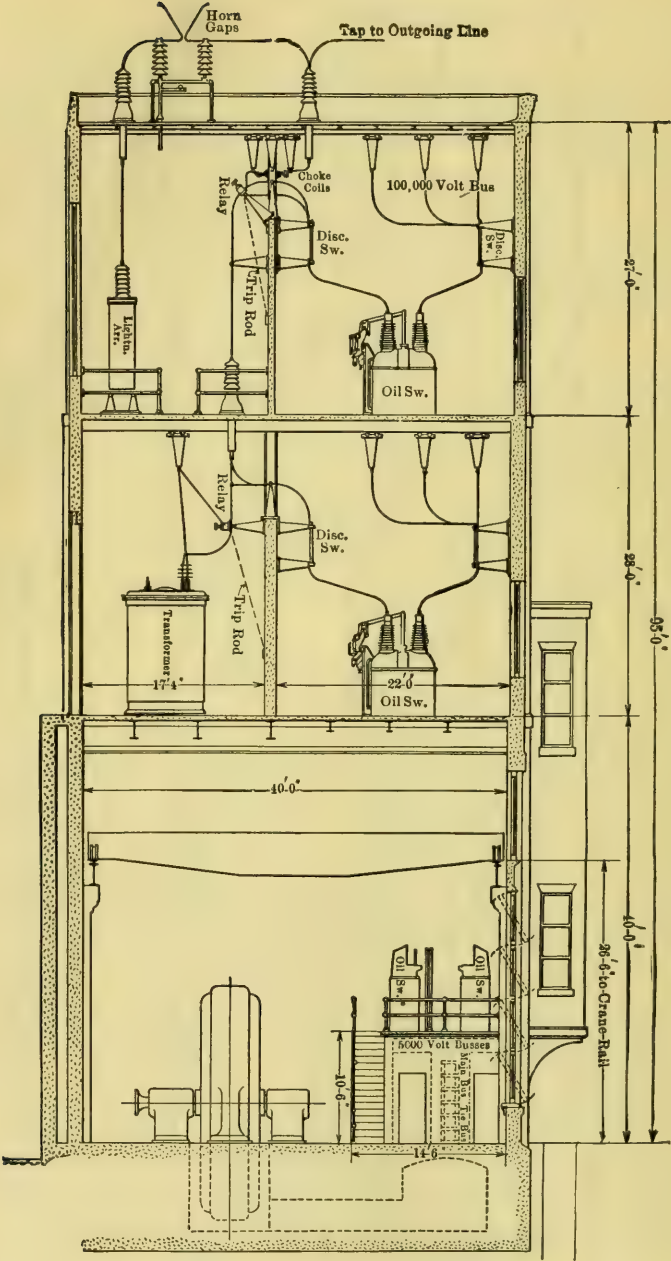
Sectional View of Hydro-Electric Power-house Arrangement with Limited Space. (For floor plans see Fig. 100A.)
